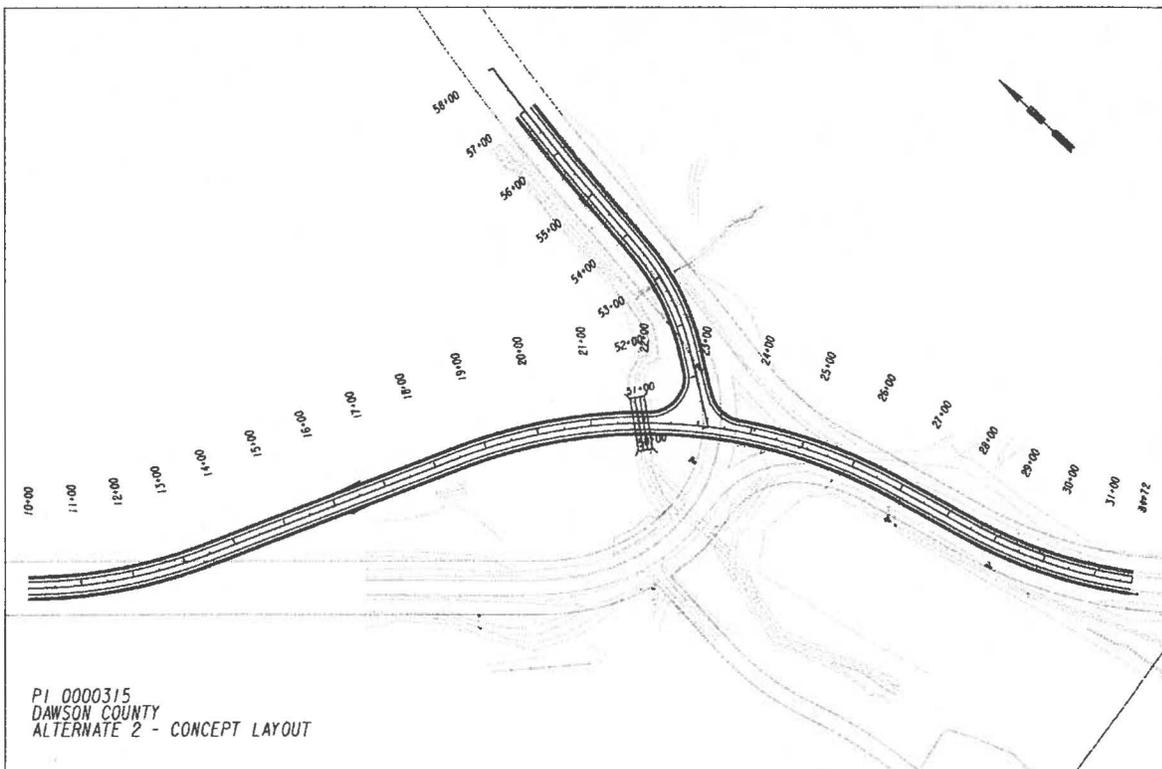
Alternate 2, T-Intersection to North of Existing Y-Intersection
